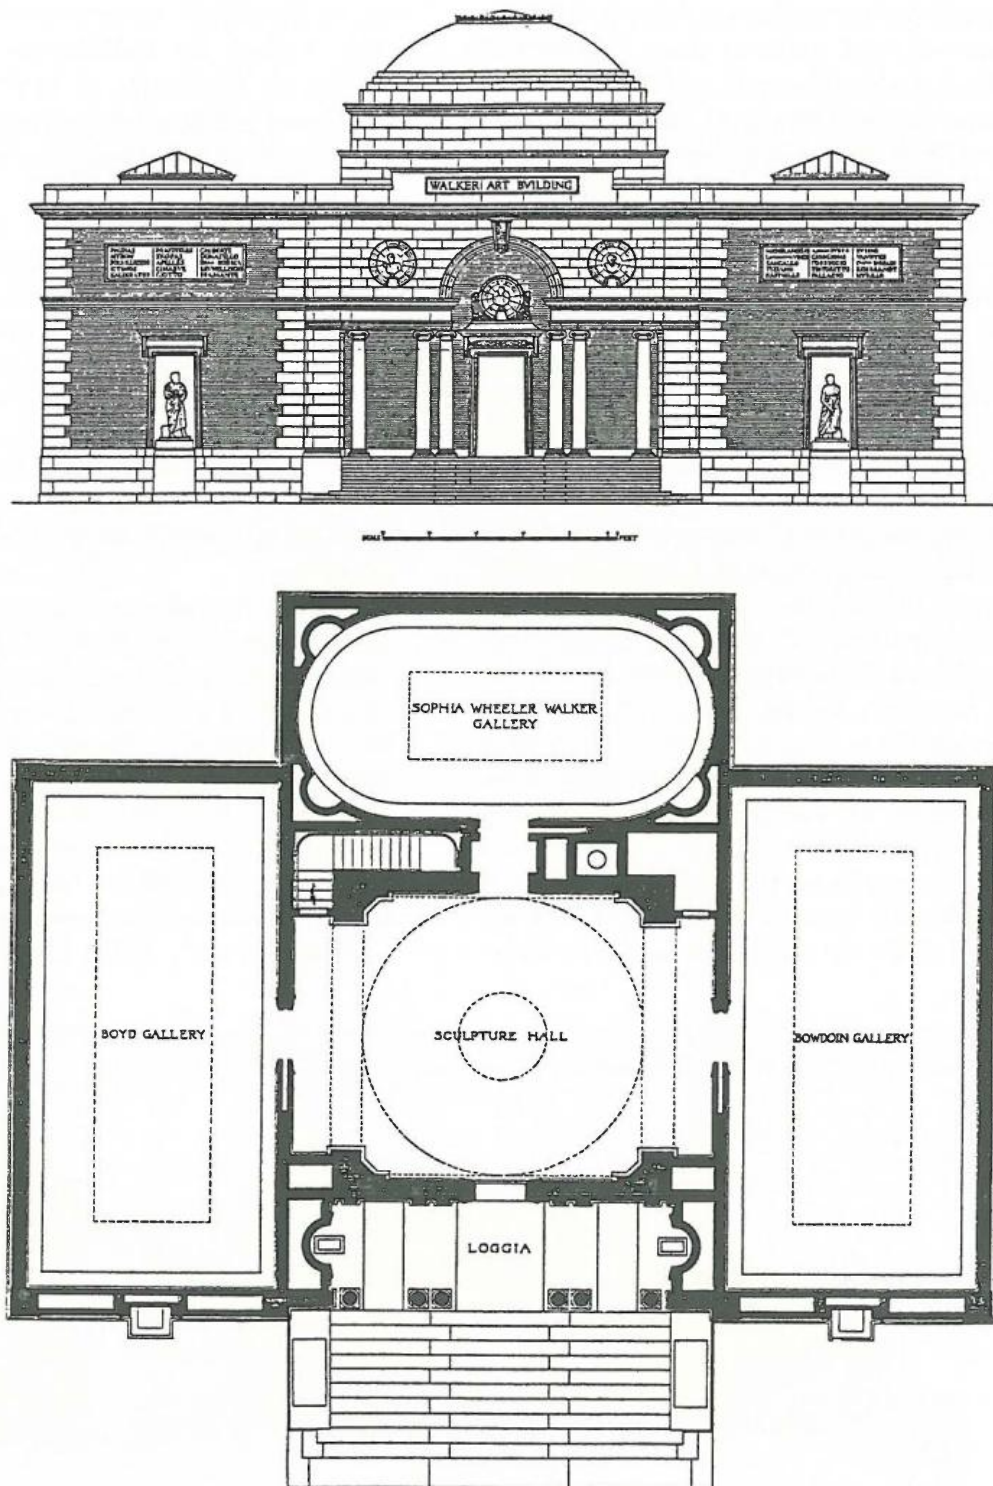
Elevation and Floor Plan of the Walker Art Building (The Monograph of the Work of McKim, Mead & White, 1879-1915, 4 Vols., New York, 1915-1920).
